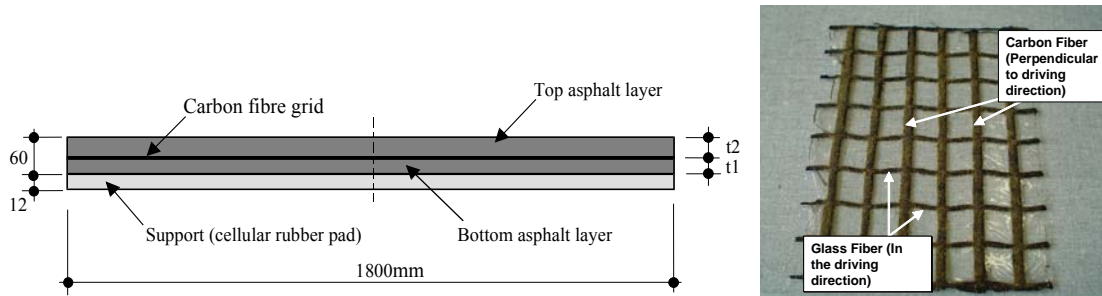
Longitudinal cross section of the asphalt concrete specimens for MMLS testing and Carbon fibre grid (units in mm)
